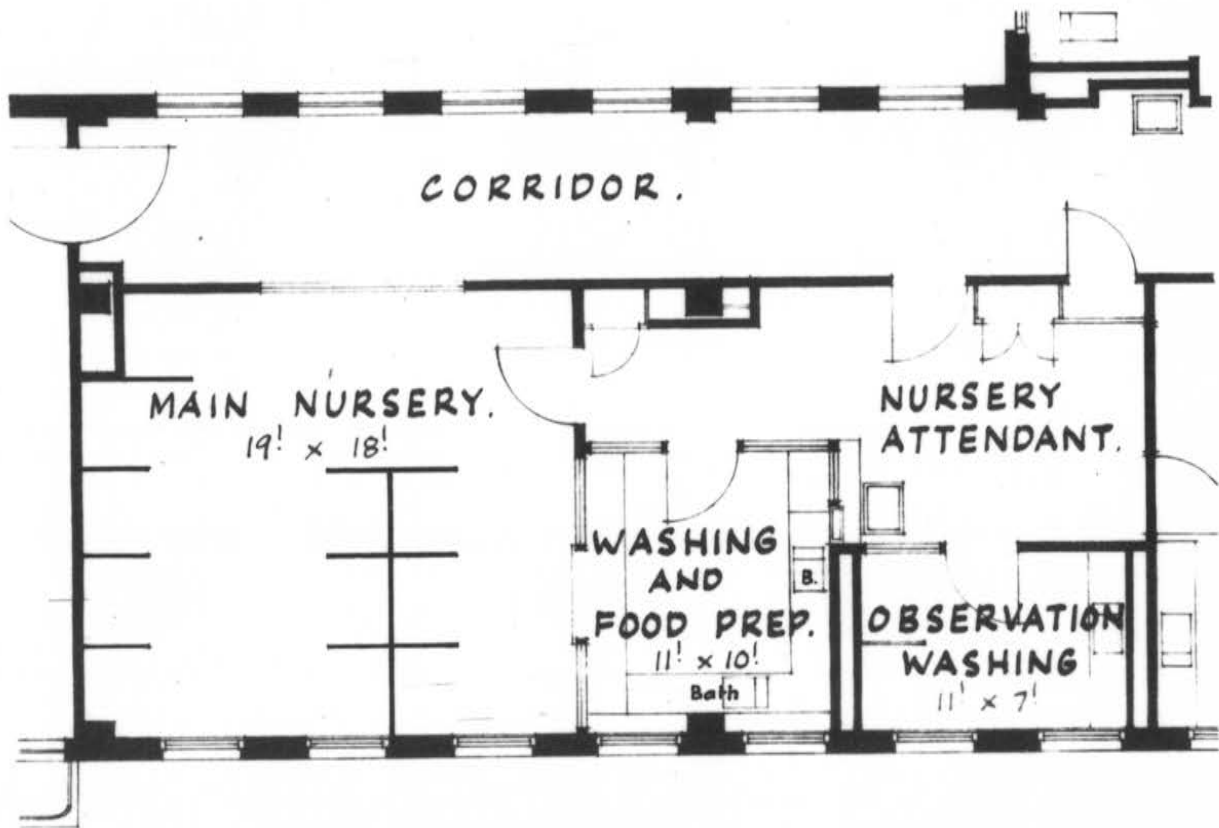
GROUND PLAN OF TYPICAL GENERAL NURSERY
